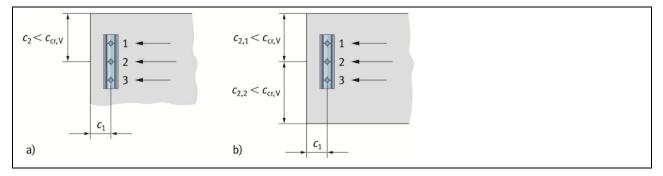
Anchor channel with anchors influenced by one (a)) or two (b)) corners, anchor 2 is under consideration - example
